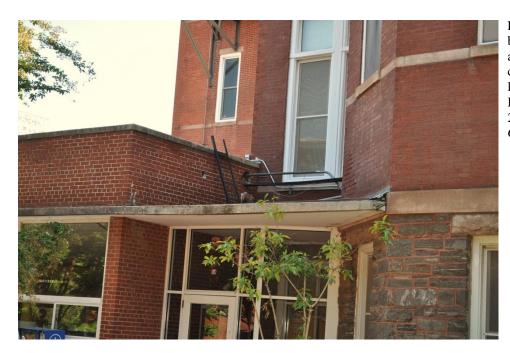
North basement entrance at point where water closet was once located; Bradley Building at left; 2011. *Photo, Beth Grashof.
